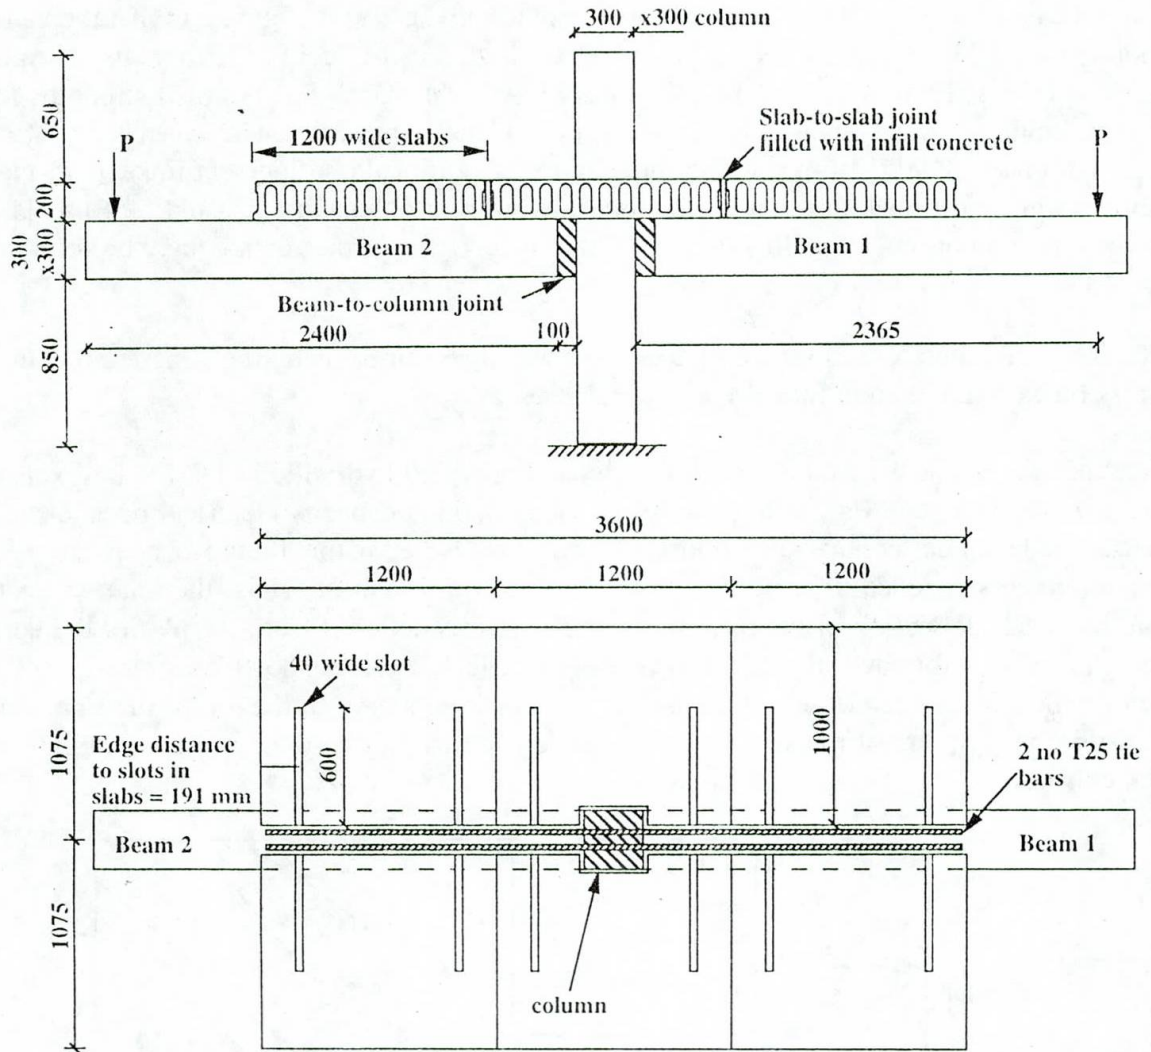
Arrangement of full scale precast concrete connection test. (a) Elevation (b) Plan.
